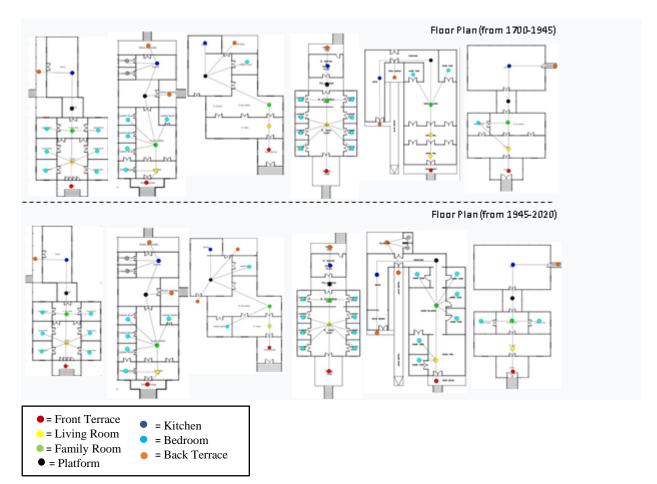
Justified Graph Floor Plan Traditional Malay House West Borneo
